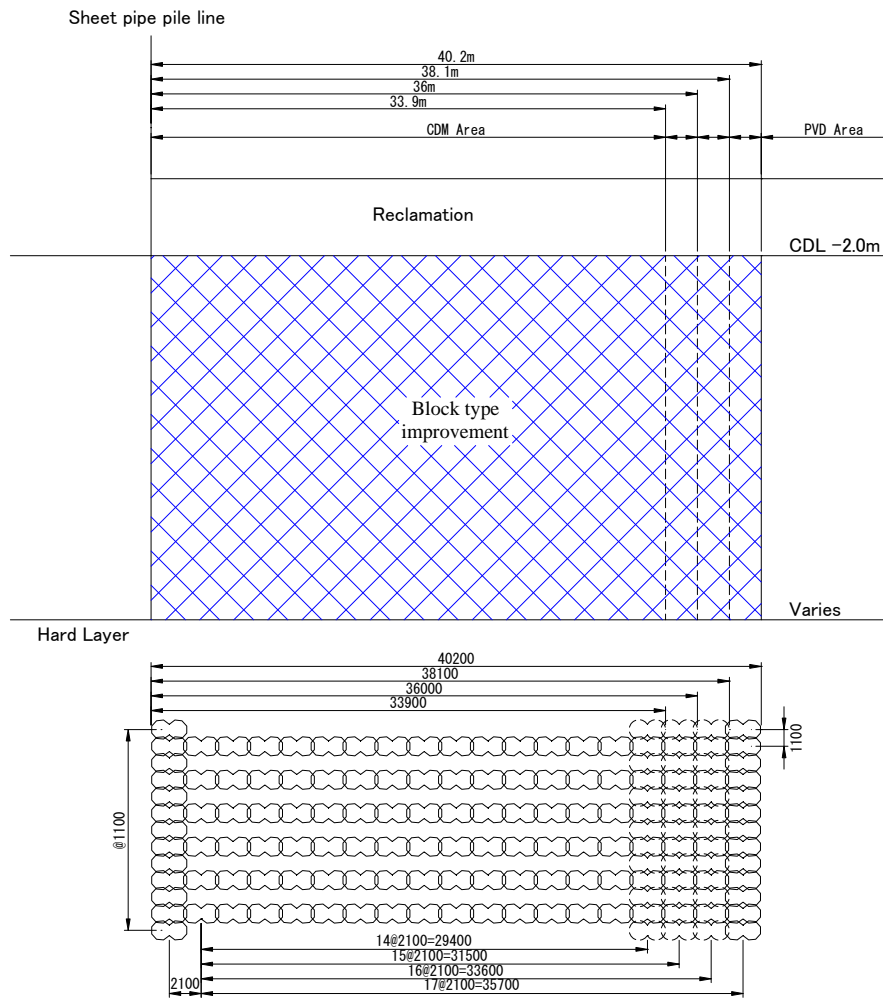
Details of CDM Piles Layout Plan and Cross Sections
